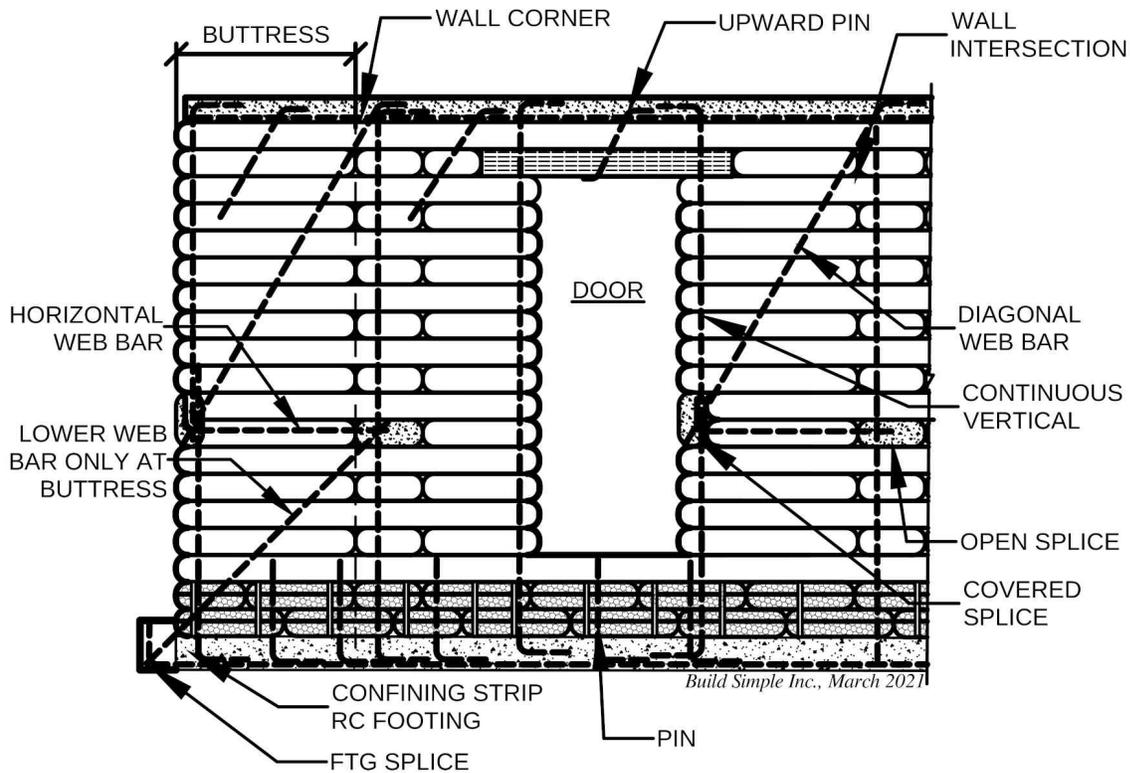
Full wall height rebar truss assemblies can be built with high strength CE footings.
